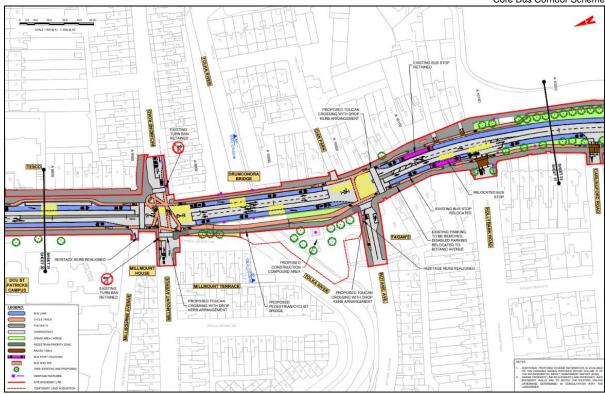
Extract from General Arrangement Drawing (Sheet 31)
